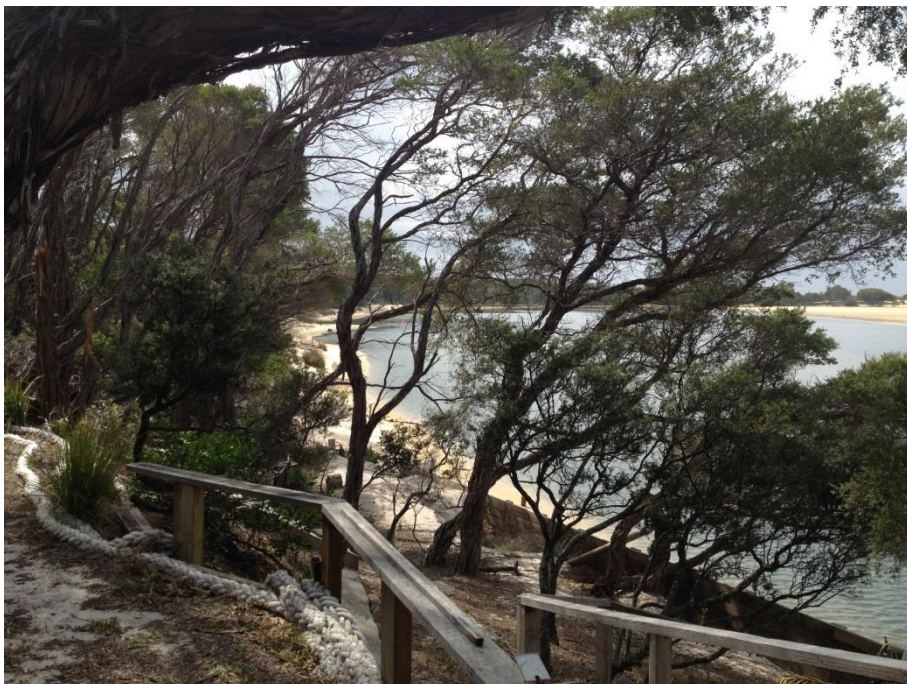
Vegetation and Landscaping at Top of Seawall
